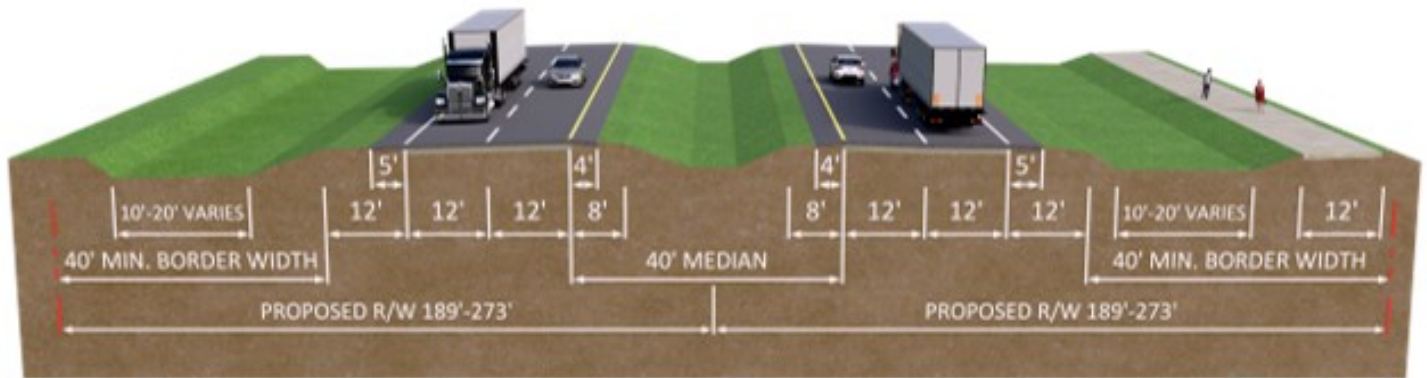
Preferred Alternative Roadway Typical Section: Approximately One-Half Mile West of C.R. 721 to C.R. 721
